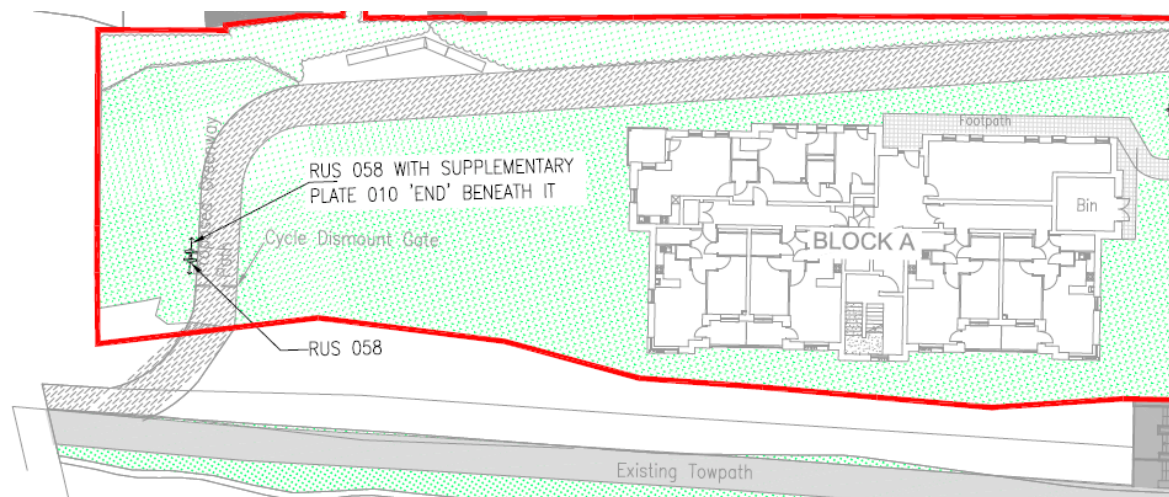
19160-15C PROPOSED ROAD MARKING AND SIGN LAYOUT
